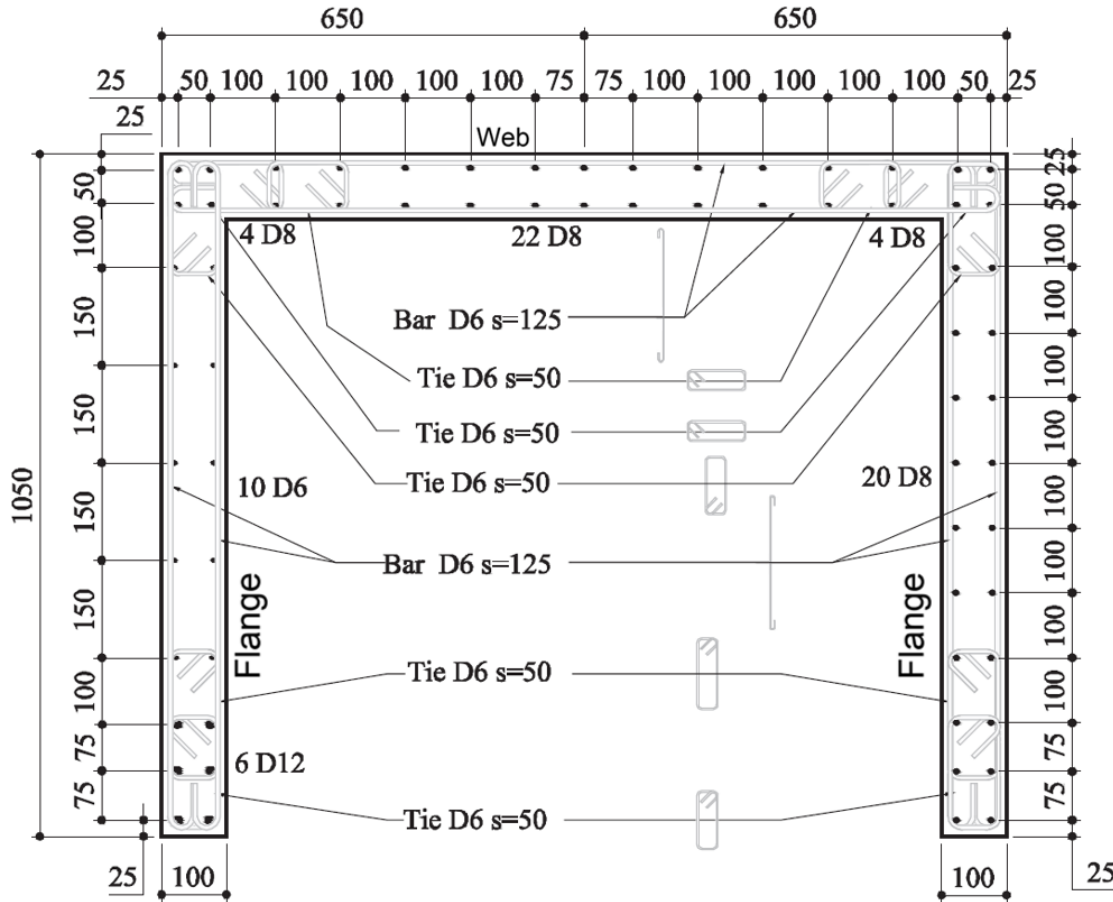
TUC: Cross section and reinforcement detailing from [6] [Unit: mm].
